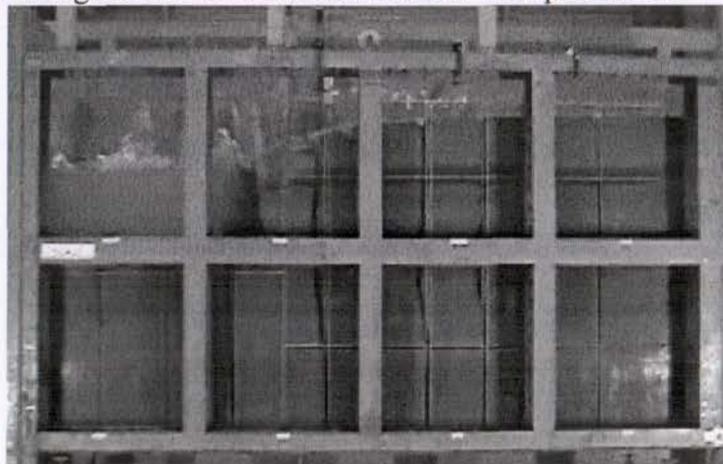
Lateral spreading of the sheet pile wall (NIED (website) 2006)
